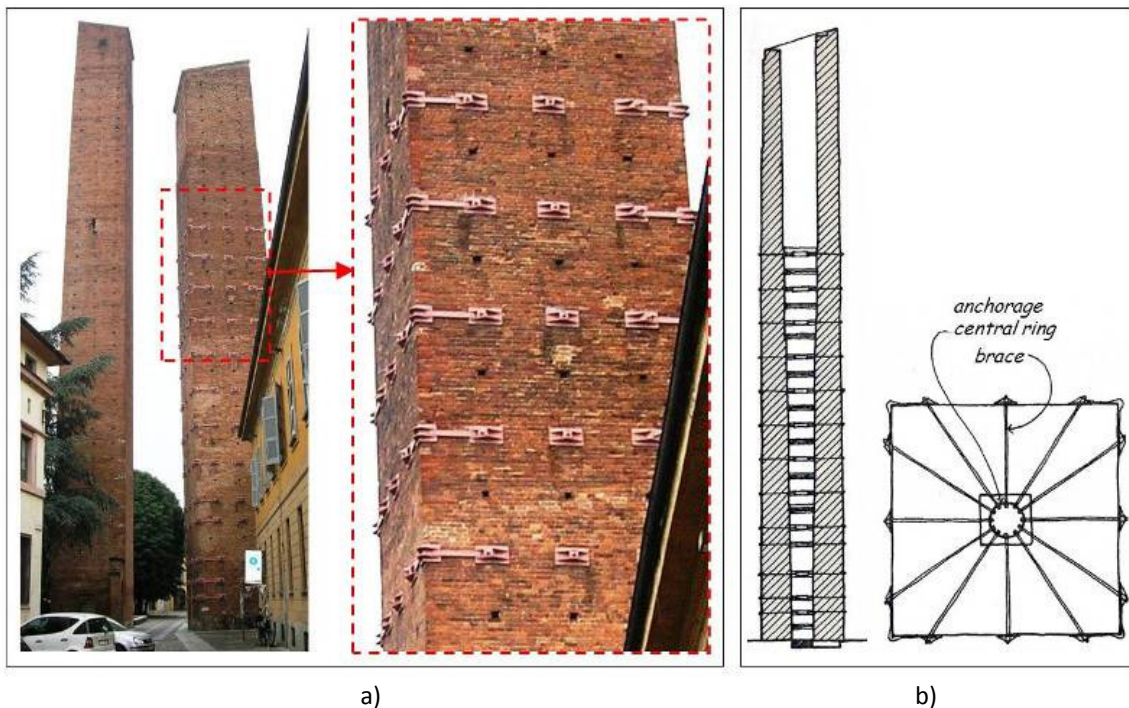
Strengthening design for the Fraccaro Tower in Pavia: a) general and detailed view of the tower and the anchors of the bars (author's pictures); b) layout of the design (from M. Levy and M. Salvadori, "Why buildings fell down. How structures fail", W. W Norton, 1992, p. 227). (Salvadori, 1992)
